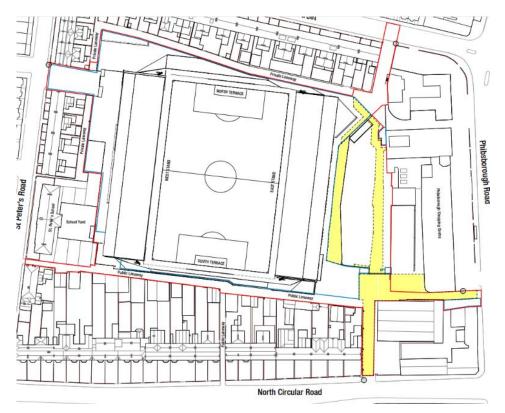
Proposed Site Plan (Source: Idom & Gilroy McMahon)
